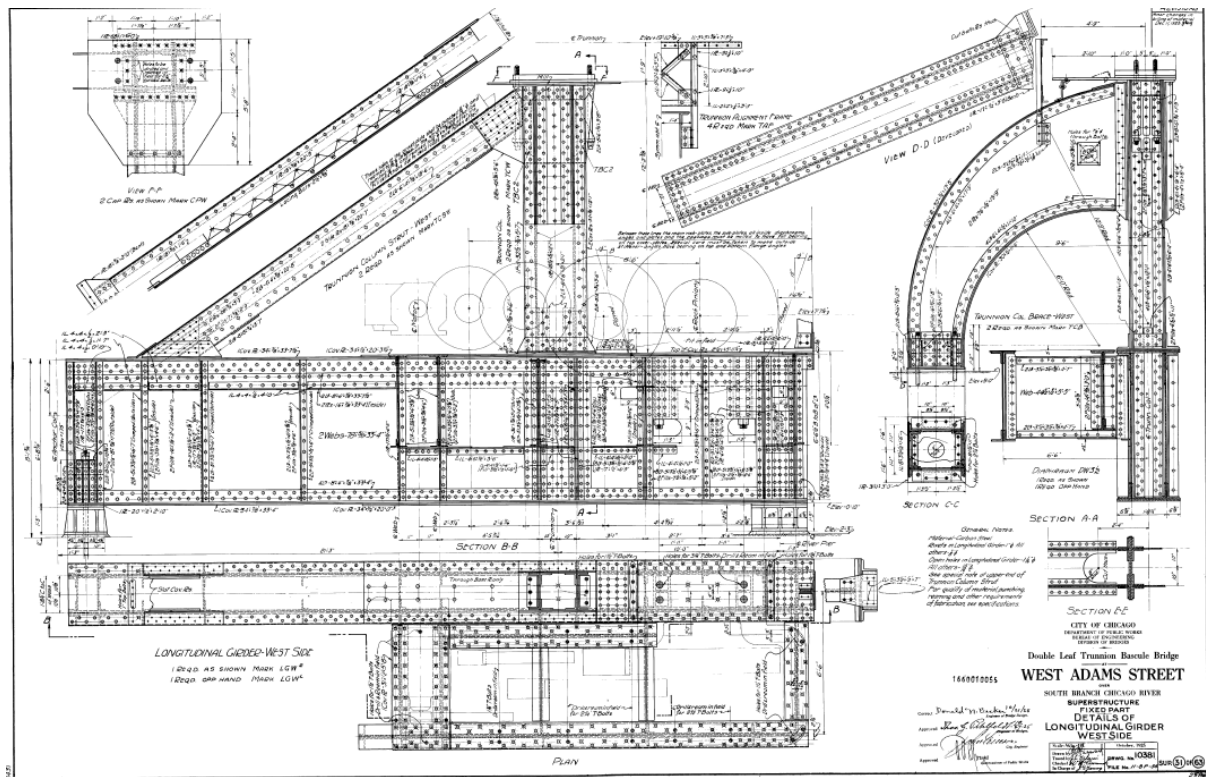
Longitudinal Girder with Trunnion Column and Brace
